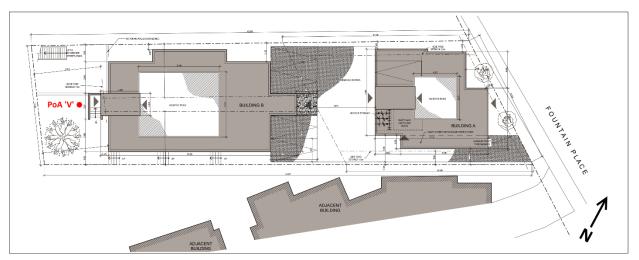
Site plan showing location of Point of Reception POA 'V' at grade, along with Buildings 'A' (east side) and Building 'B' (west side).
